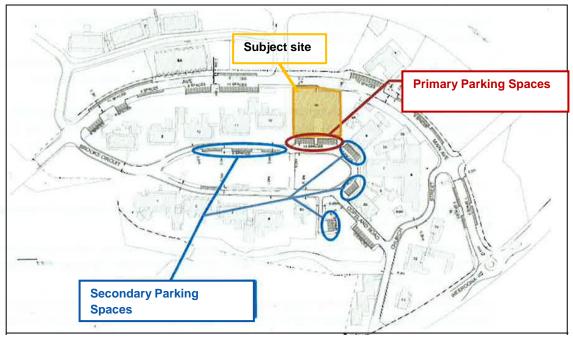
On Street Parking proposed to be used for the commercial use of the subject site.
